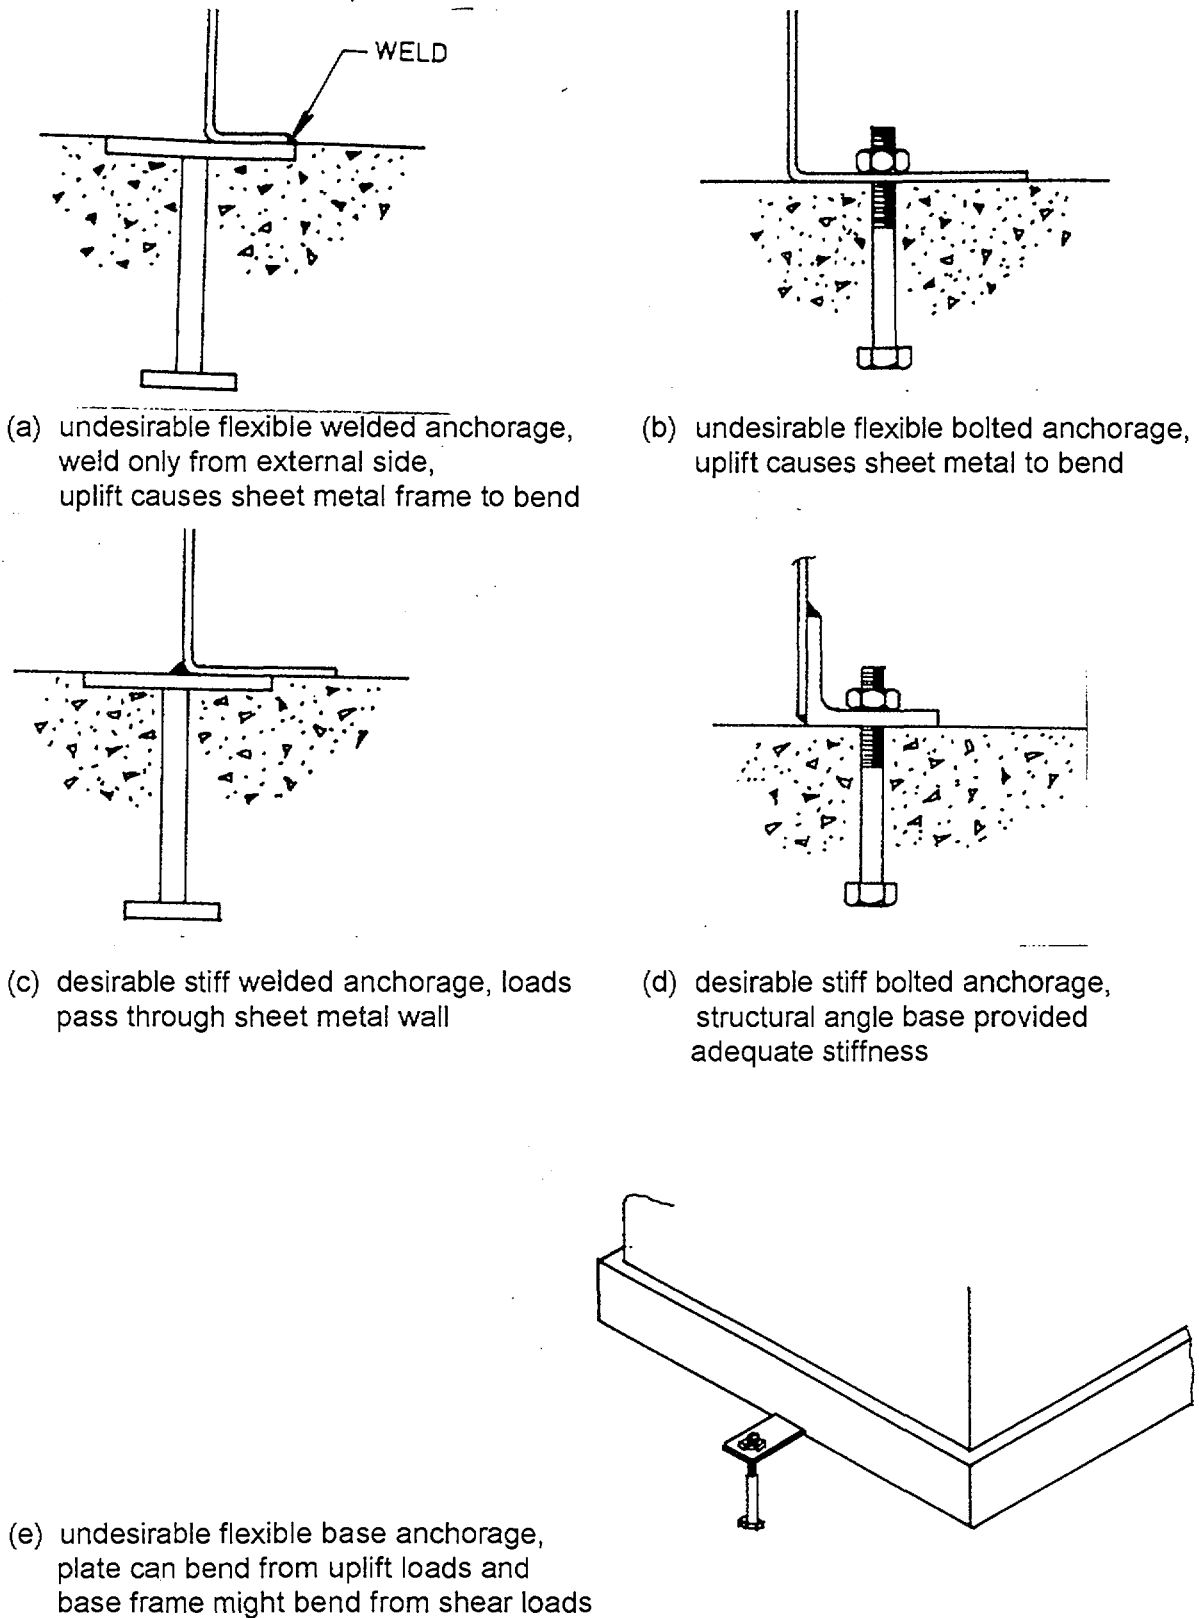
Examples of Stiff and Excessively Flexible Anchorage Connections
